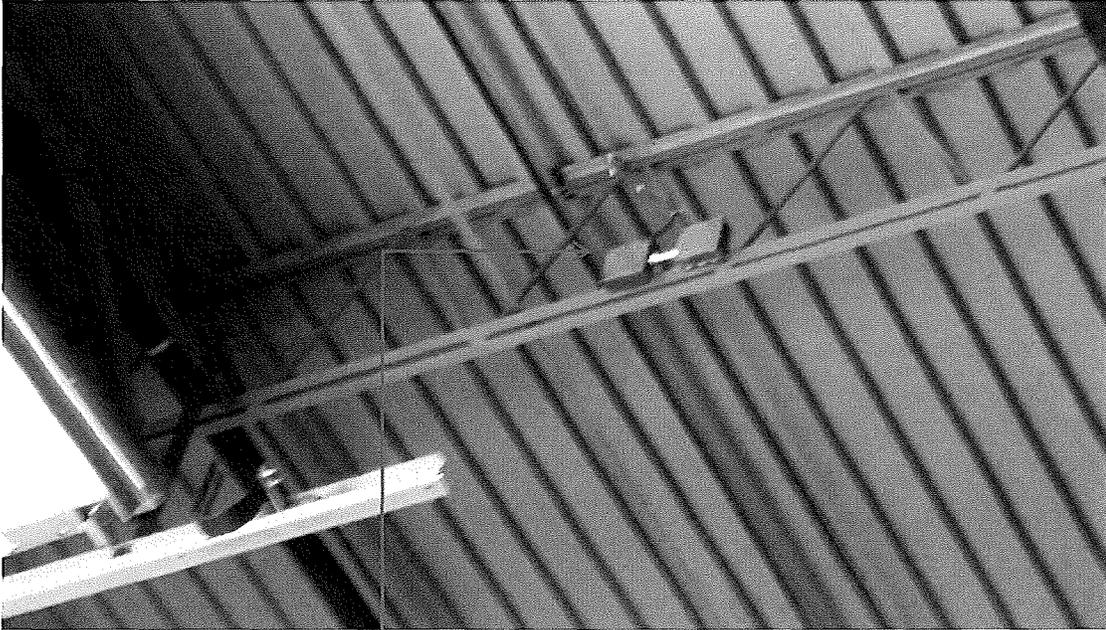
1247 Canal; typical warehouse - former location of methane monitors, red electrical boxes on ceiling trusses, column BB16.
